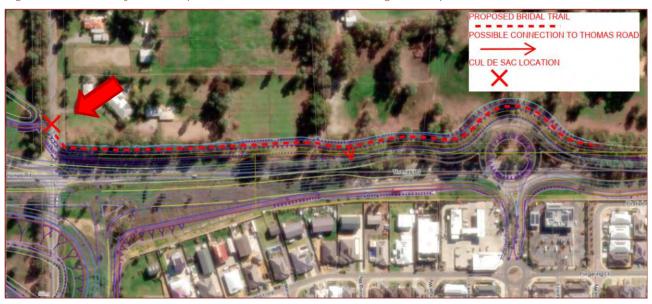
Design showing where Hopkinson Road is proposed to be made into cul de sac (red cross)
